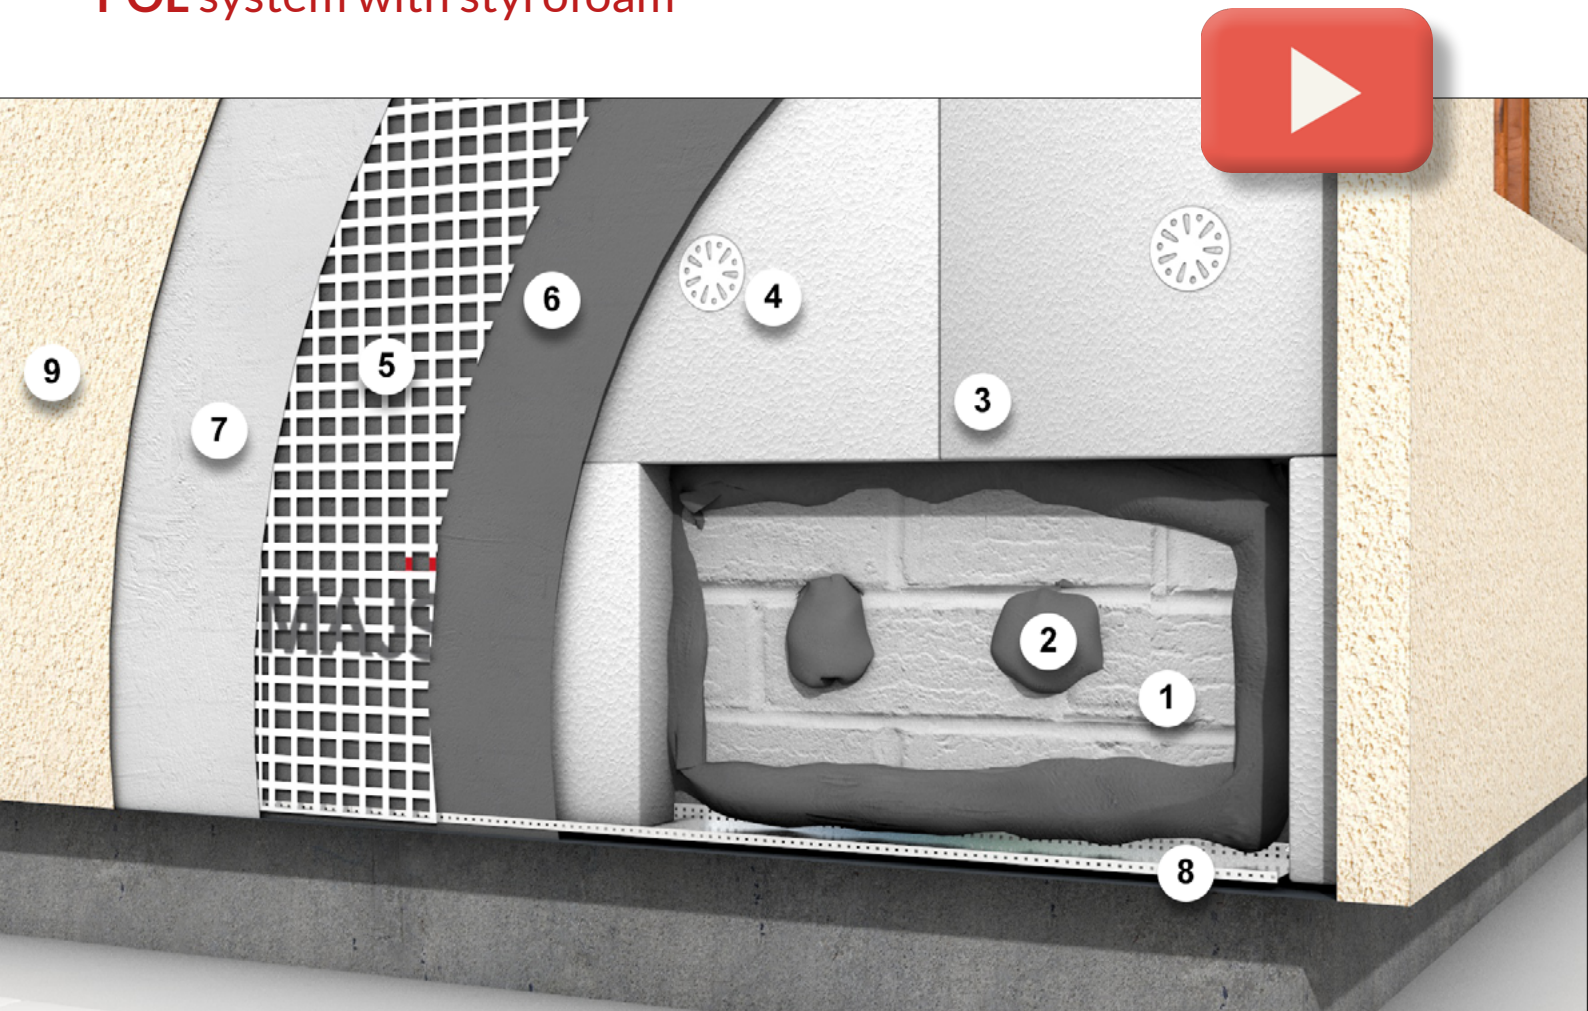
Cross section of layers of ETICS MAJSTER-POL building insulation system with styrofoam.
